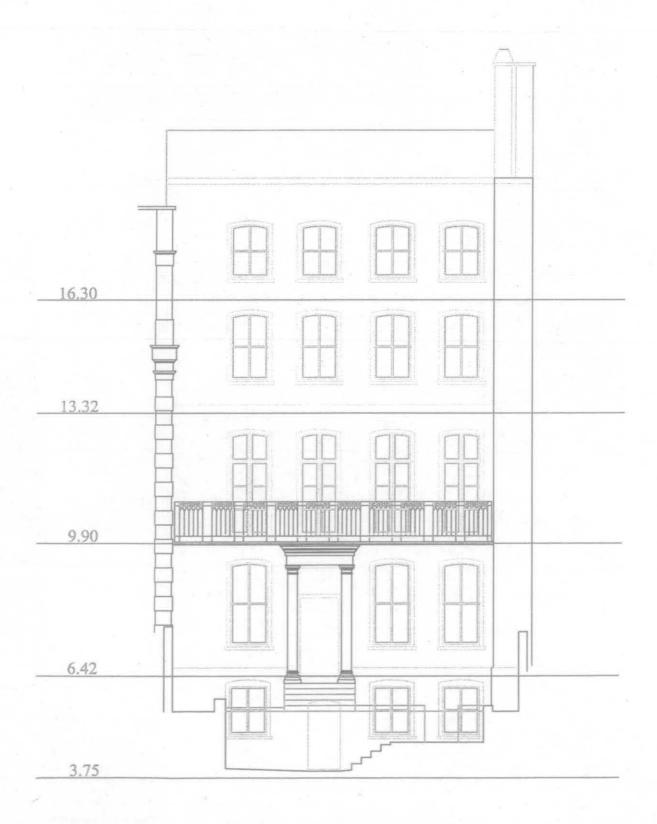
South elevation (street front), looking north (1:100; A J Browne, Architects)
